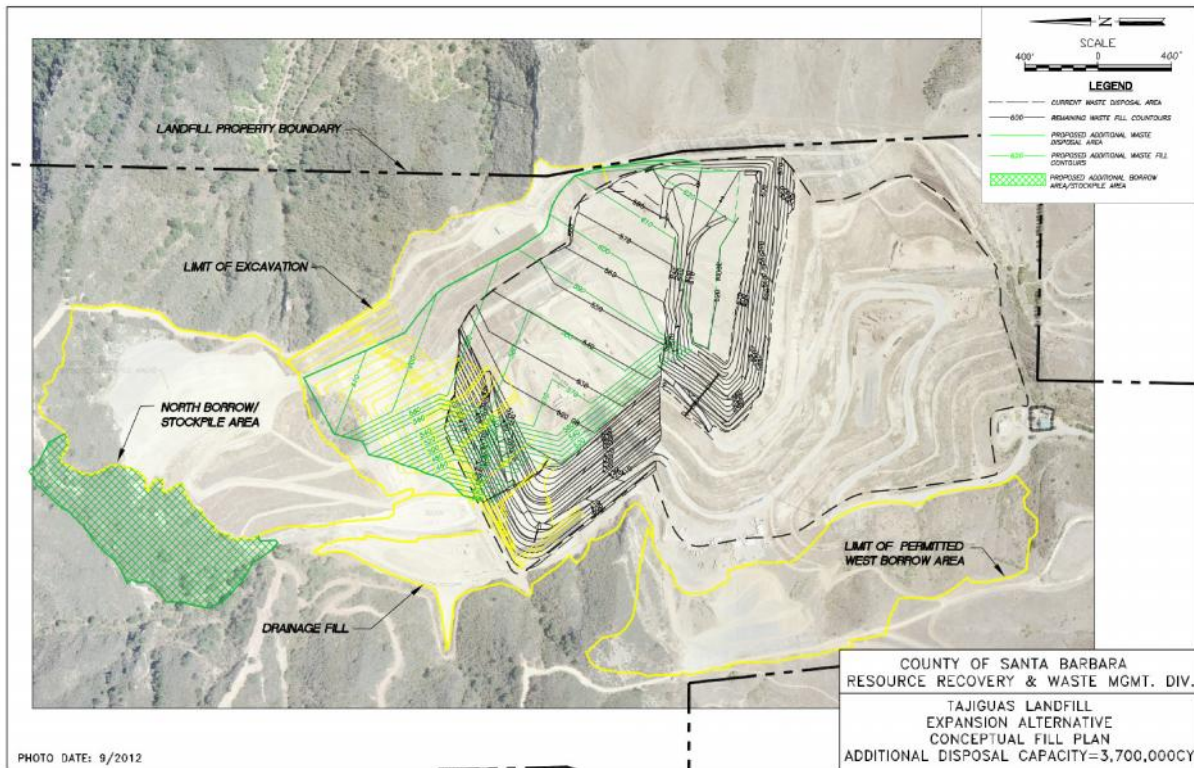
Alternative E – Tajiguas Landfill Expansion Site Plan
